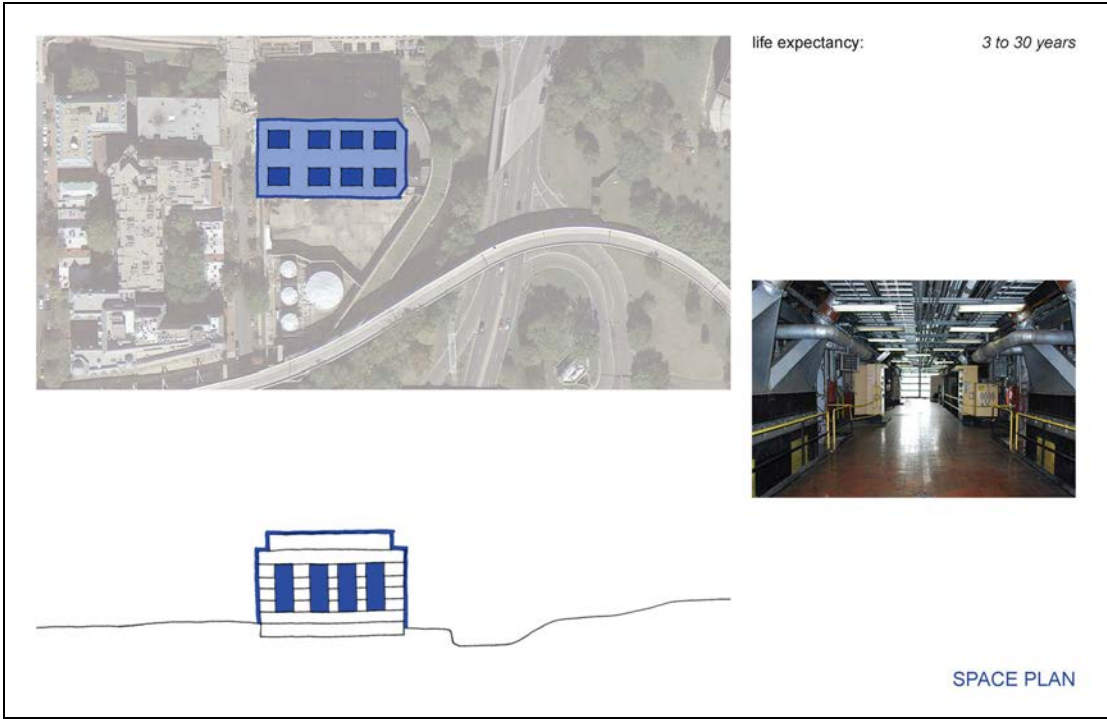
Space Plan: the existing floorplates and catwalks throughout the building
